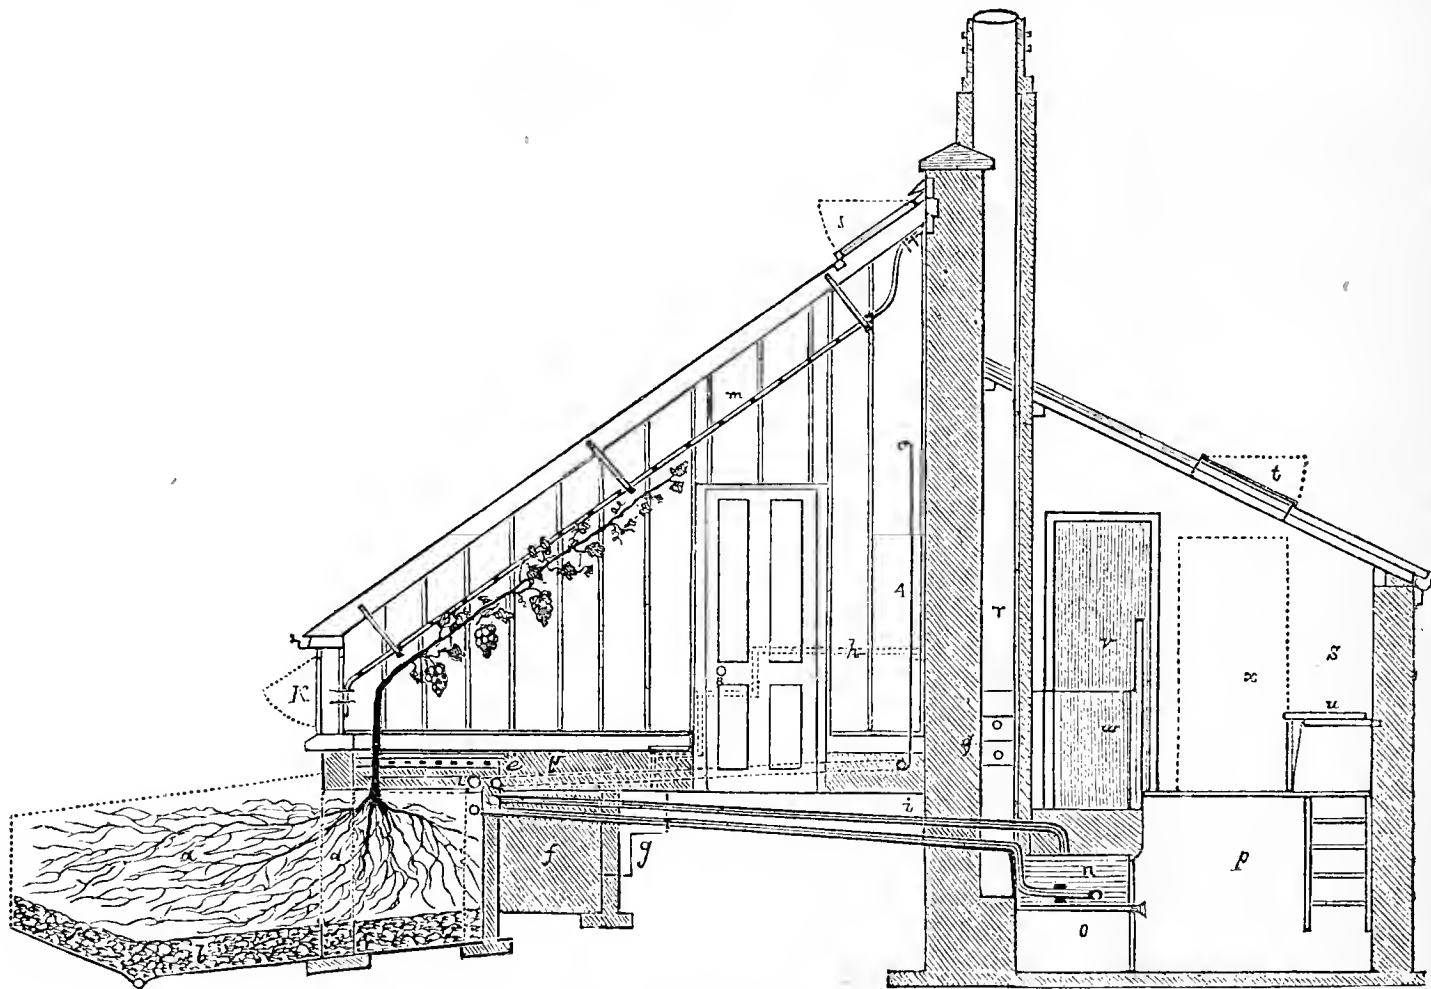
LEAN-TO HOUSE—SECTION AND END ELEVATION.
